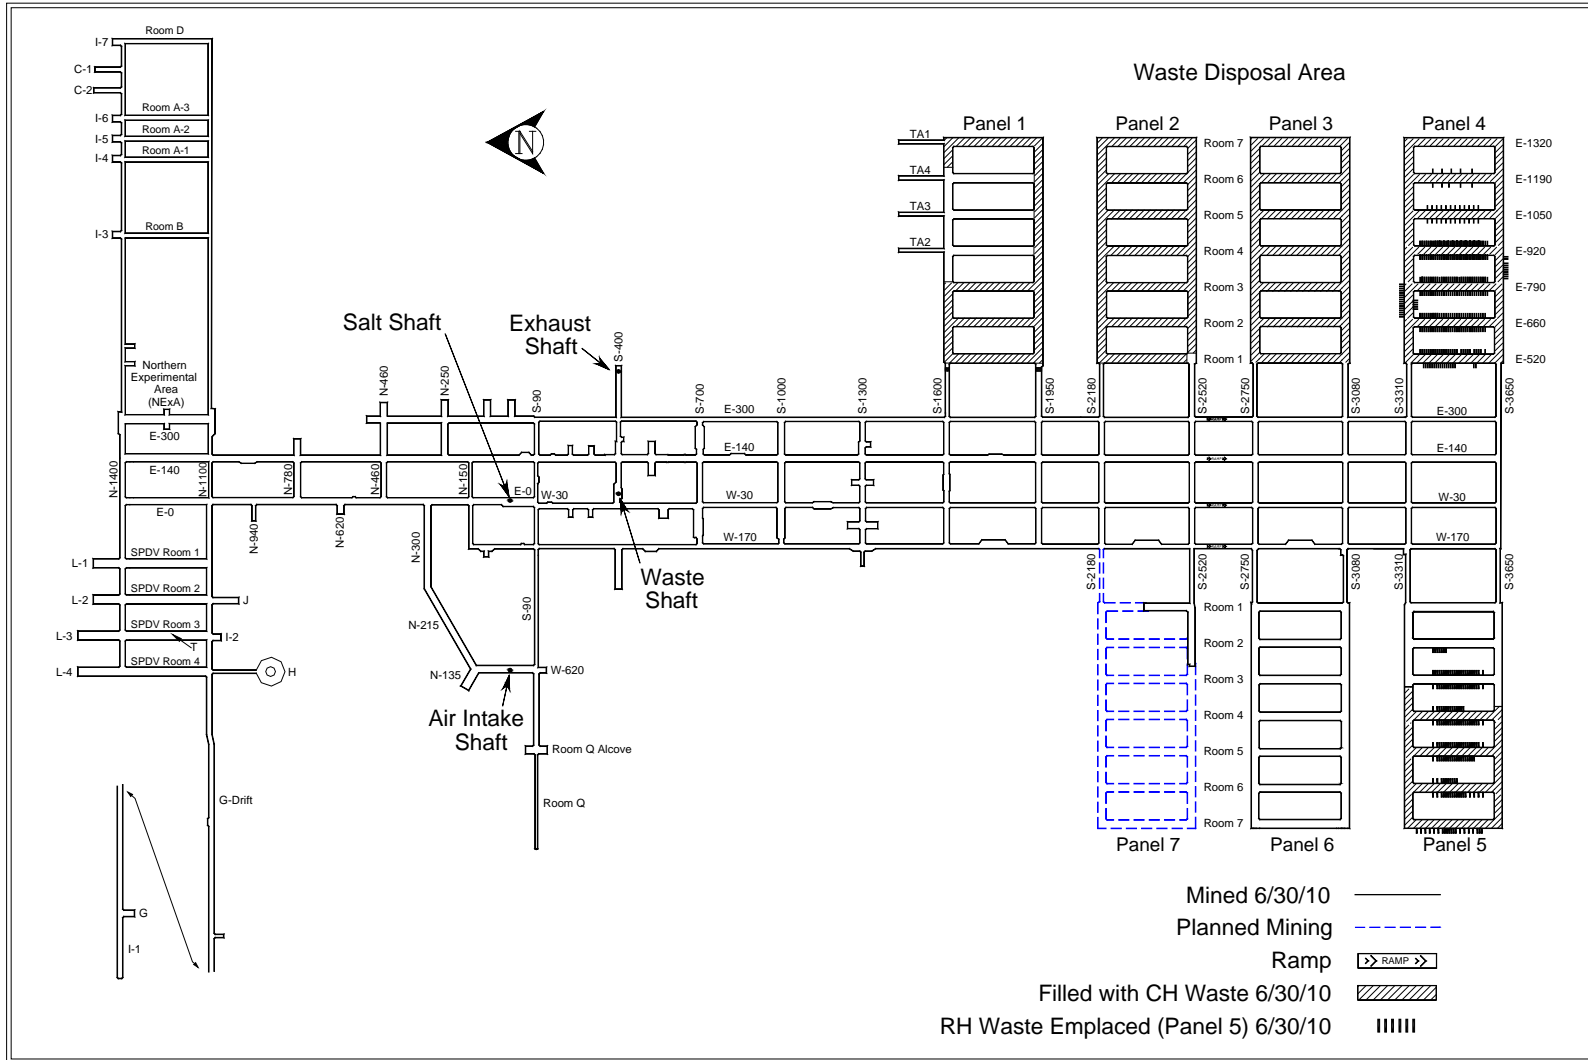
2 – Underground Mining and Waste Disposal Configuration as of June 30, 2010
